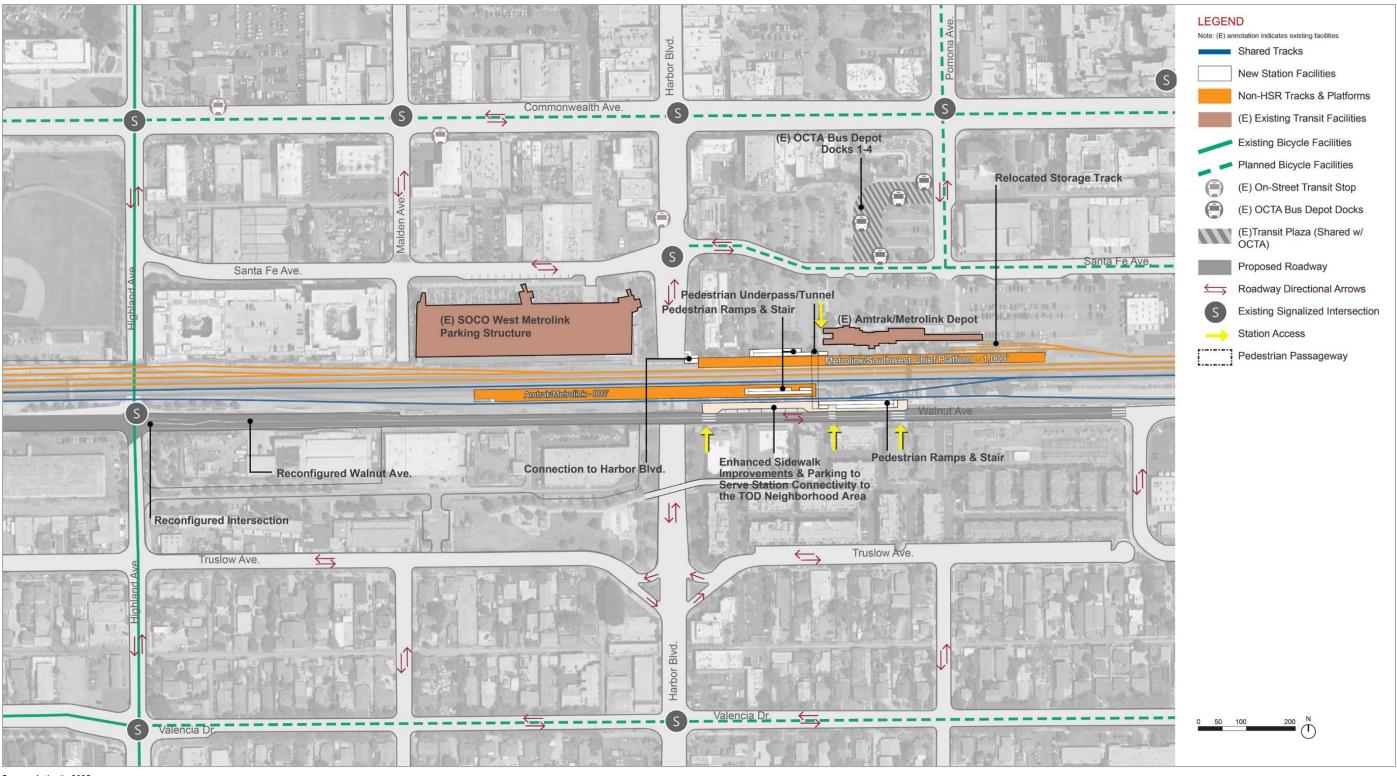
Modified Fullerton Metrolink/Amtrak Station Site Plan
